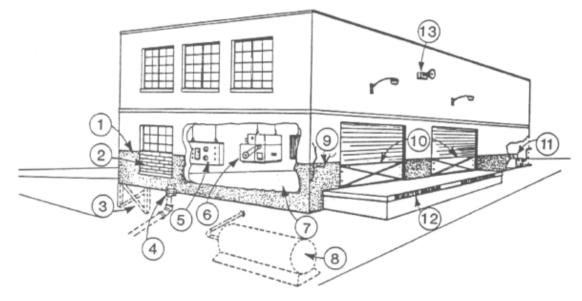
Rehabilitation or remodel (no increase in footprint) of non-residential building in an A zone – the proposed work was determined to be a substantial improvement. The building is brought into compliance by retrofit dry floodproofing measures (certification of design by registered design professional is required).
